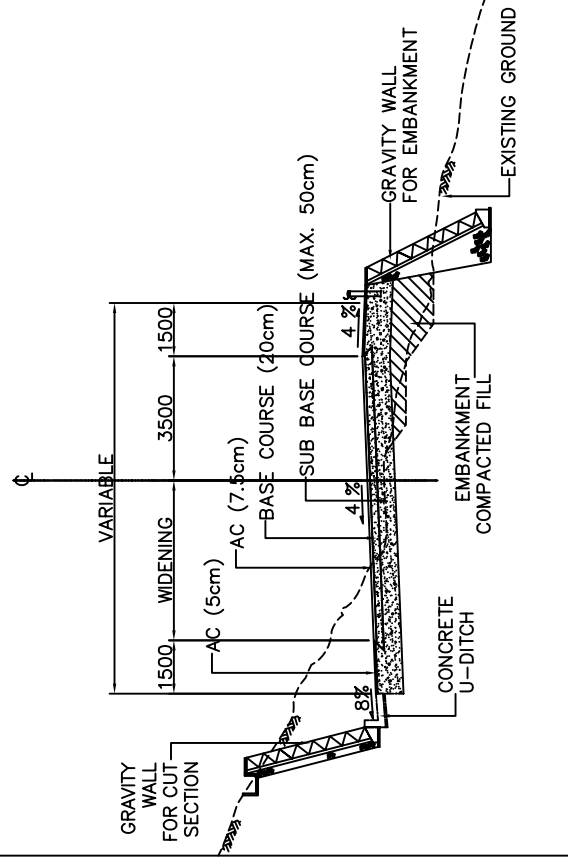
(4/5) TYPICAL CROSS SECTIONS
